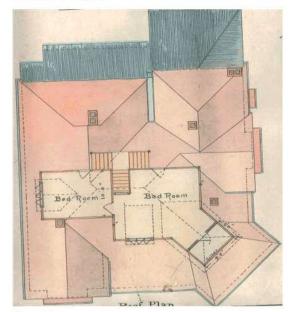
Roof plan of the proposed residence, 1909 Source: Prof. G. Murrell
